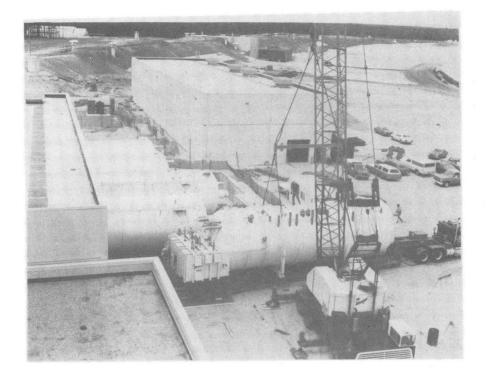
(BBC 841-533). Fifth and final cold box for CBA being unloaded June 1983. Compressor building in background.
